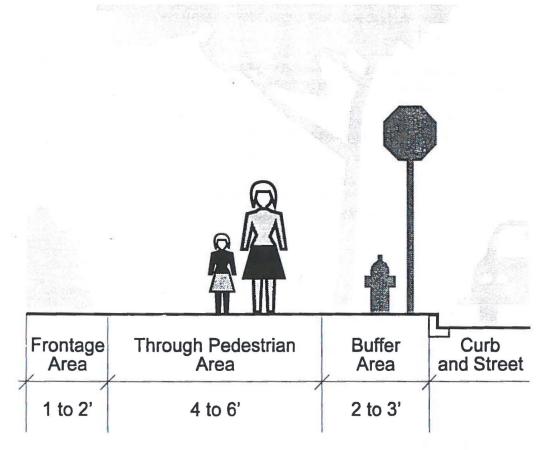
Neighborhood Sidewalk Typical Section (adapted from the Portland Pedestrian Master Plan)
